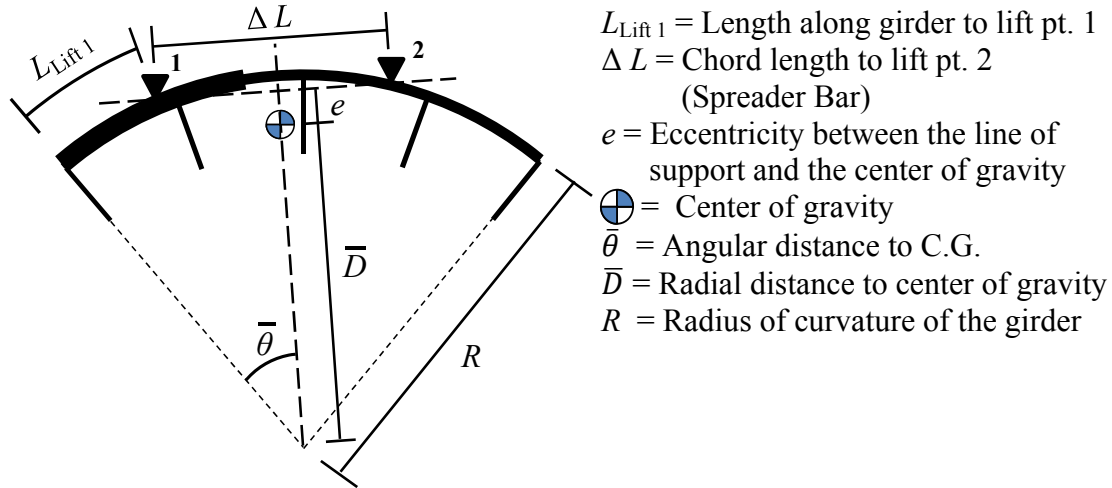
Spreader Bar used by a Single Crane Lifting a Girder
